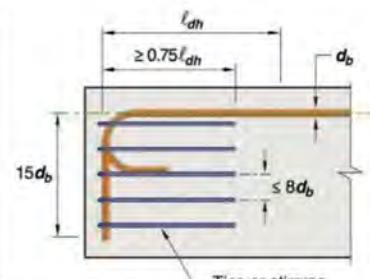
Confining reinforcement placed parallel to the bar being developed that contributes to anchorage strength of both 90- and 180-degree hooked bars.
